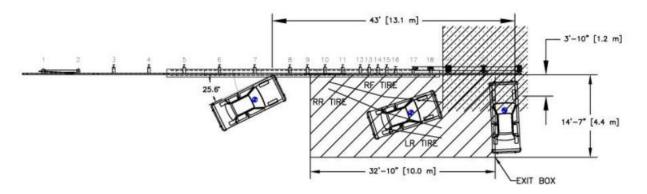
Test Impact Drawings for Test No. MWTC-2.
